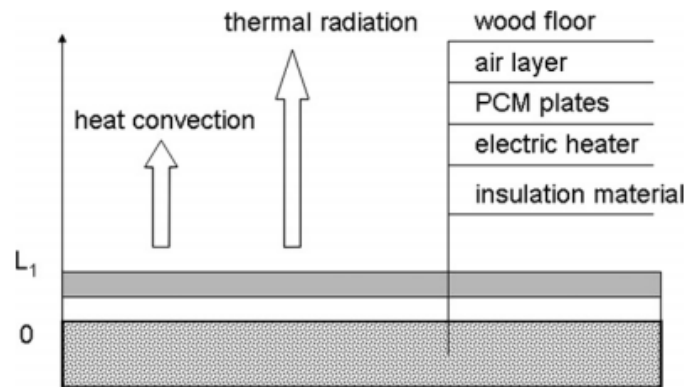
Example of underfloor electric heating system with shape-stabilized PCM plates [35]
